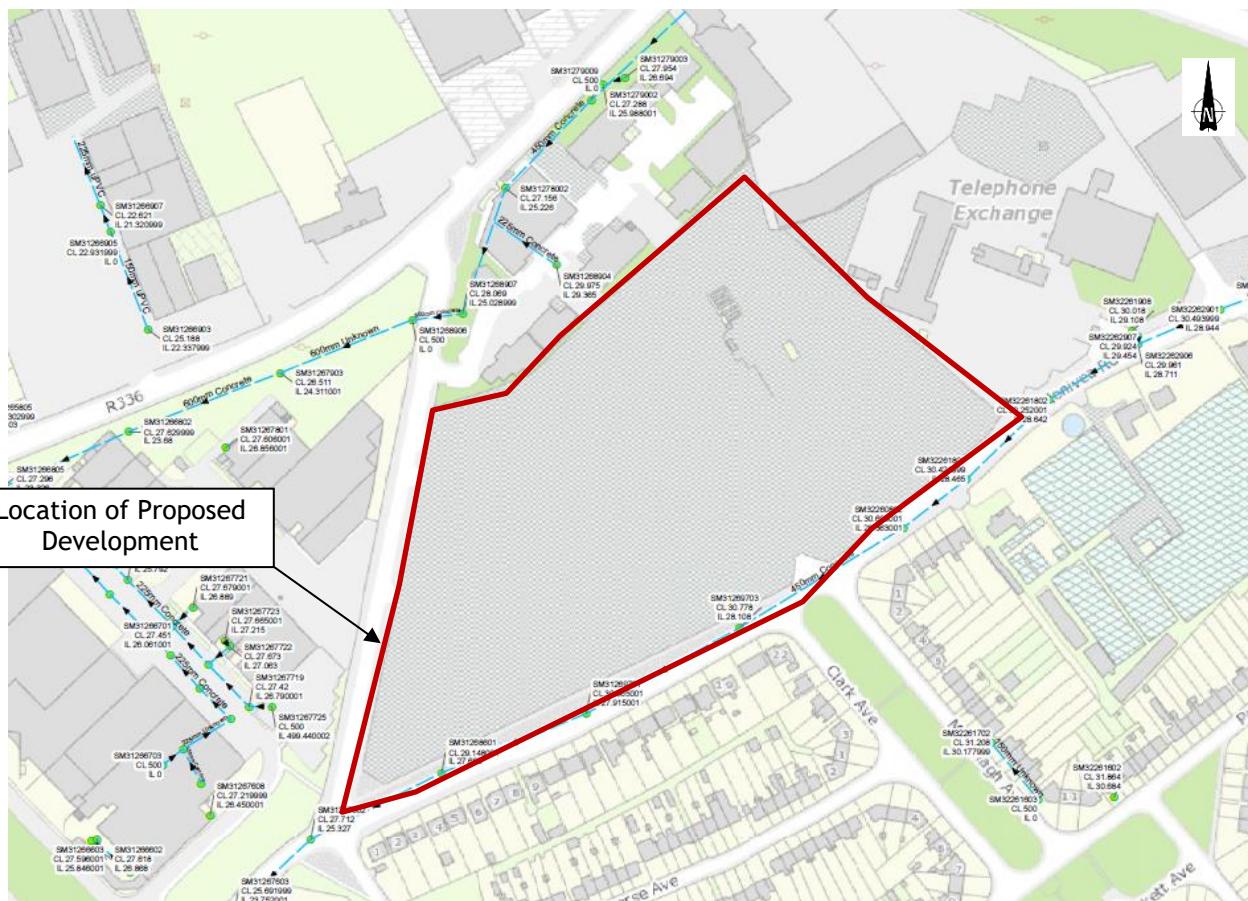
Existing Storm Drainage Surrounding Site (Source: Irish Water Record Drawing)
